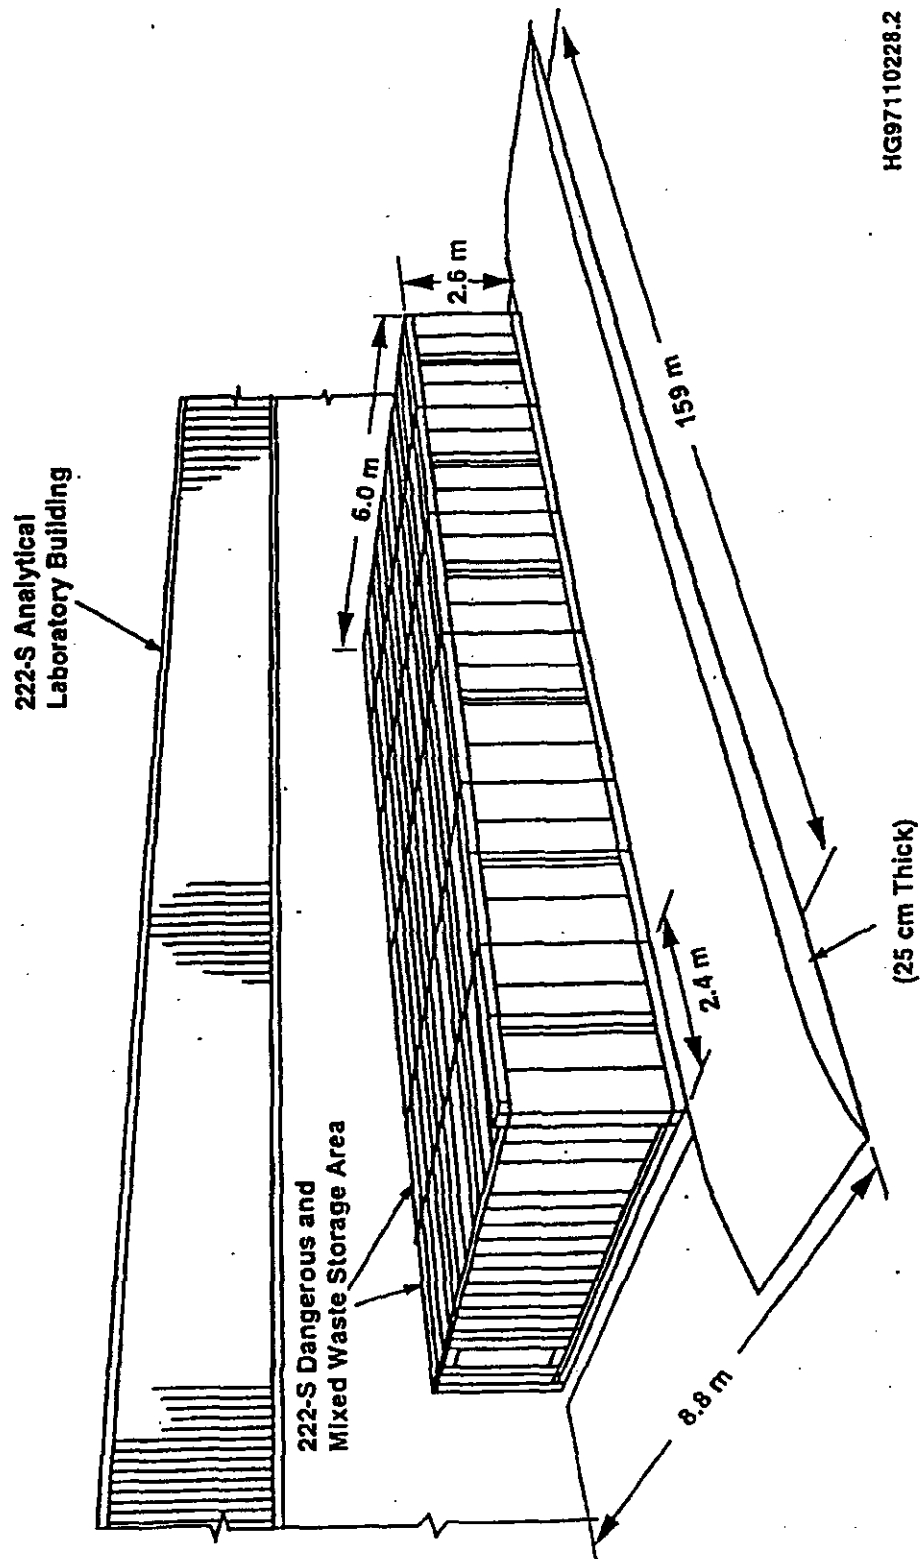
222-S Dangerous and Mixed Waste Storage Area Storage Structures.
